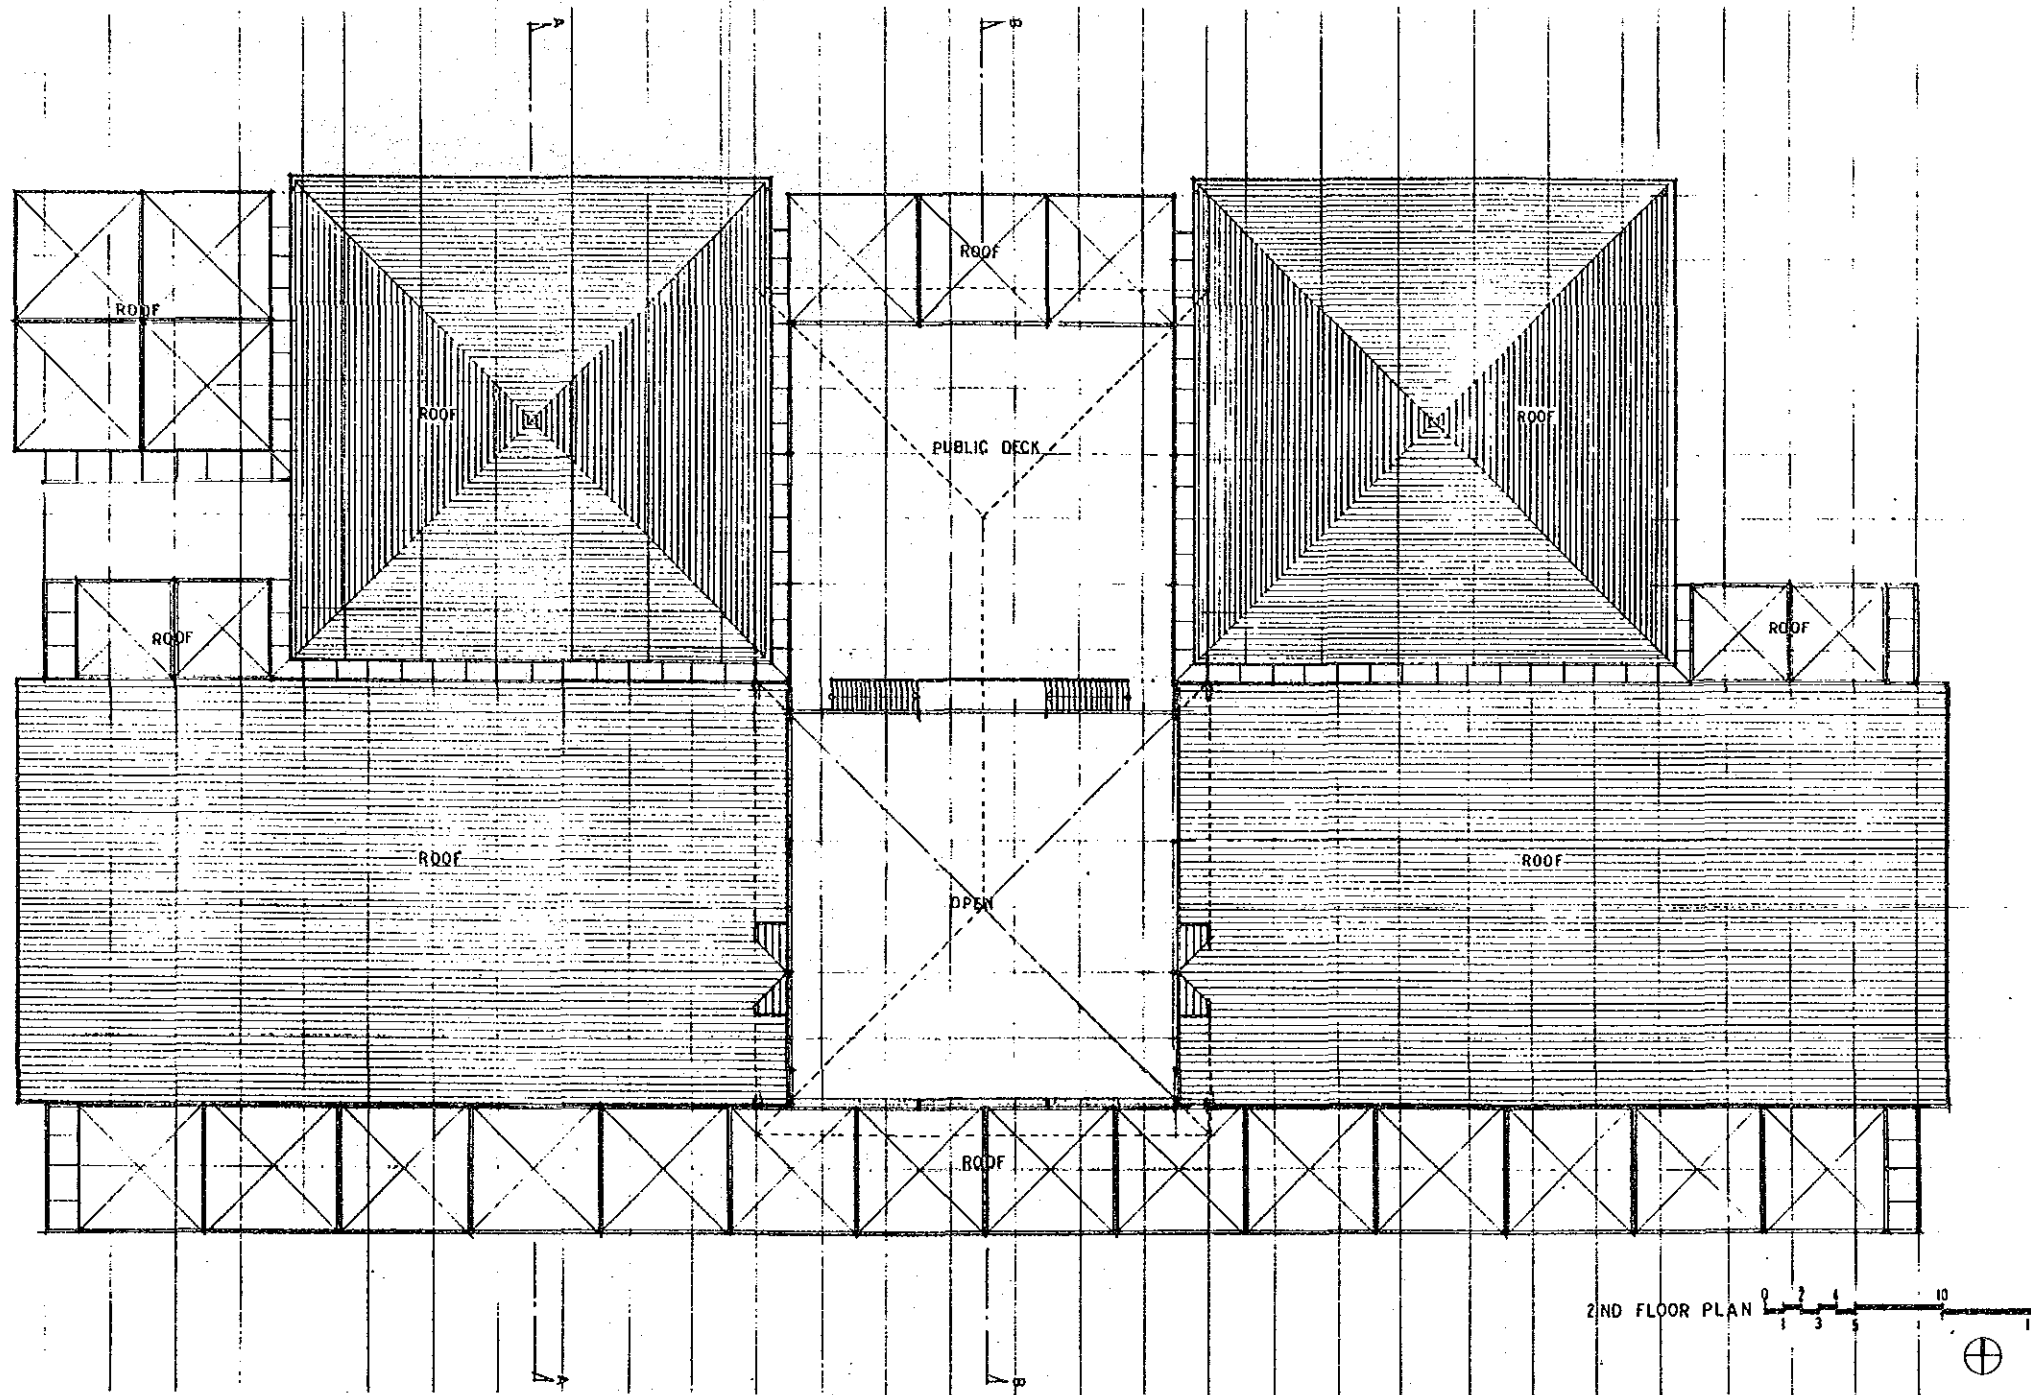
Passenger Terminal Building (Second Floor Plan)
